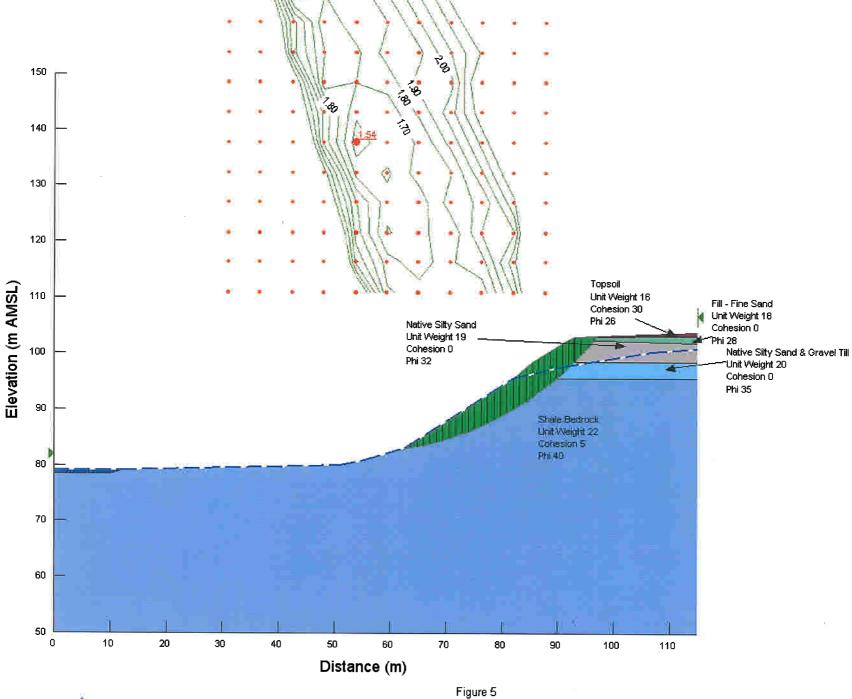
T040022-A1 Slope Stability Analyses Section A-A - Deep Failure Proposed Residential Dwelling and Guesthouse 904 Mississauga Heights Road, Ontario
